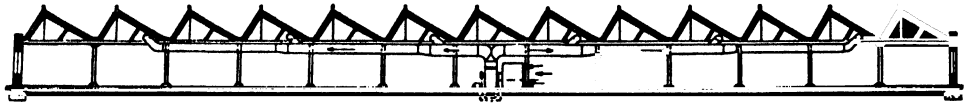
ARRANGEMENT OF HEATING AND VENTILATING PLANT
